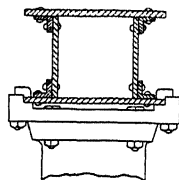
Method of Obtaining Fixing to Box Girder.
